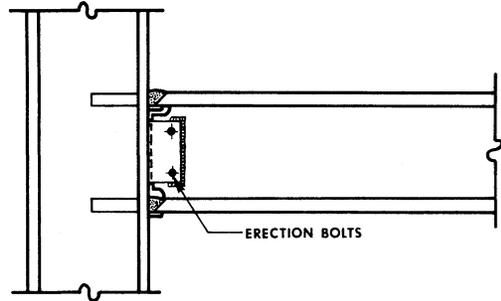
Moment connection using shear connection plate. Welding plate to web after completion of flange welds avoids high shrinkage strains.
